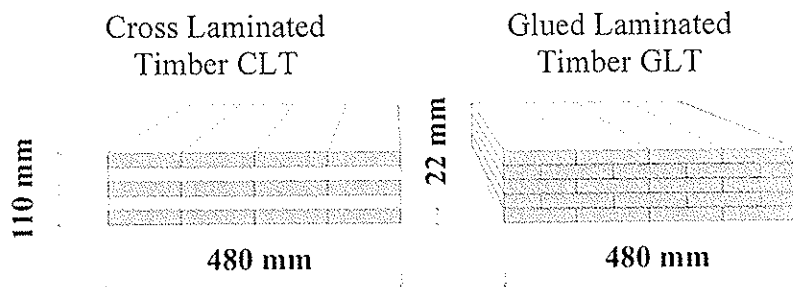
Cross sections of testing material Cross Laminated Timber CLT and Glued Laminated Timber GLT
